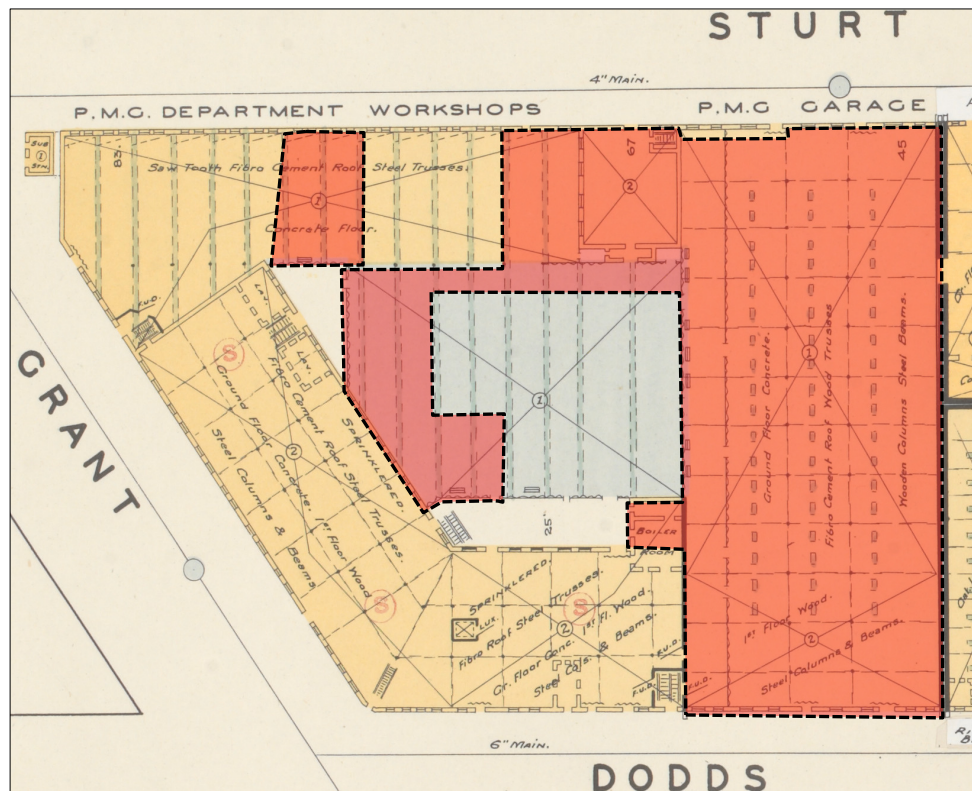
A c1950 fire insurance plan of the subject site. Buildings are shaded red where demolition has since occurred. Source: State Library of Victoria.
